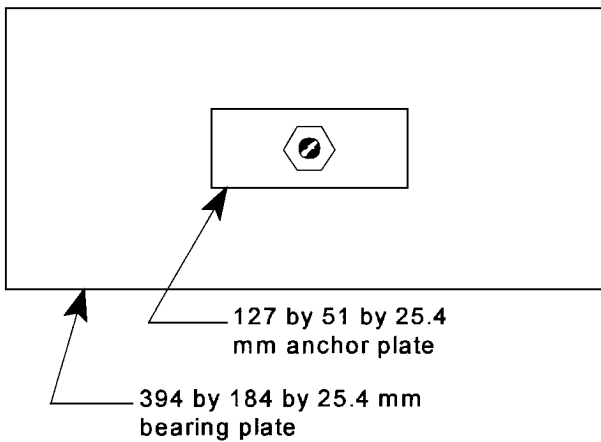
Discrete plate anchorage configuration consisting of a bearing plate, anchor plate, and hexagonal nut.
